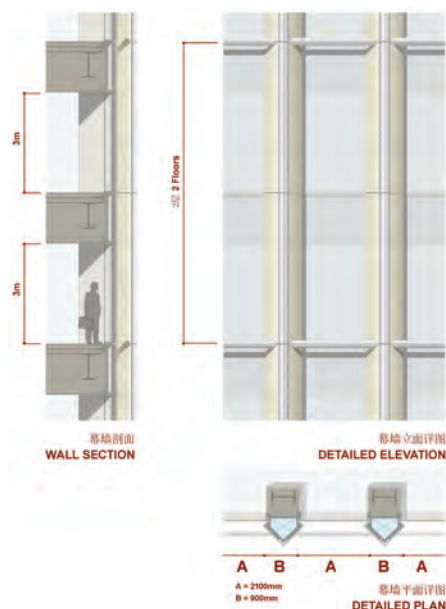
Rhythm of façade curtain wall (Source: CCDI Group)
